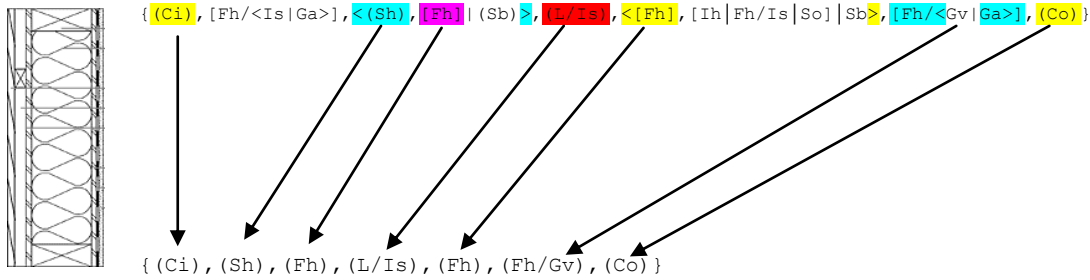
Outside wall construction awrrho03a (Source: www.dataholz.com)
